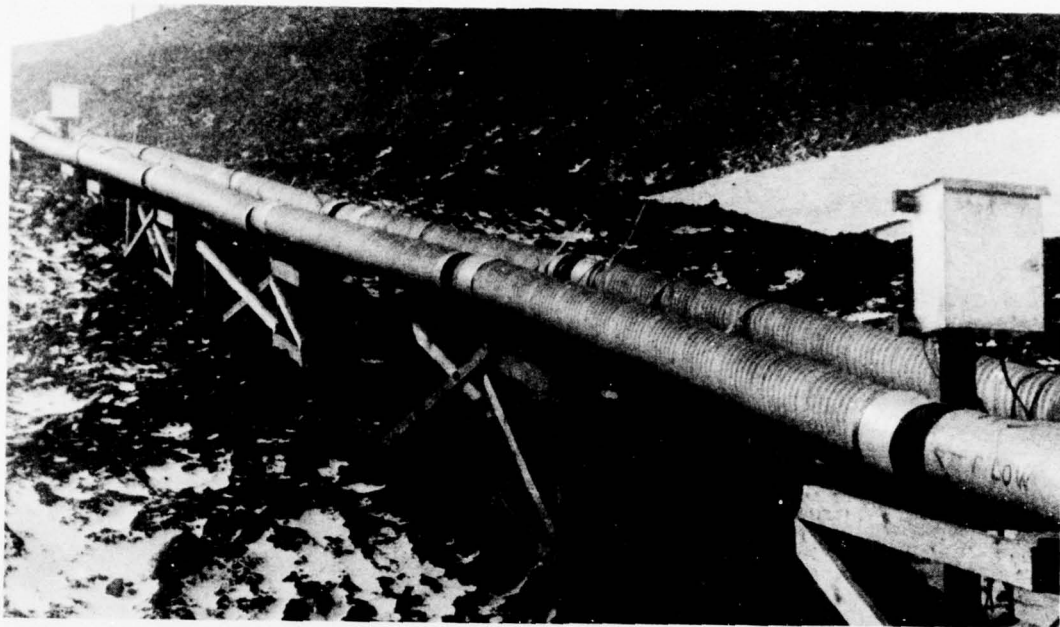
Typical wooden cribbing supporting piping system. Piping is original saltwater and brine-return lines.
